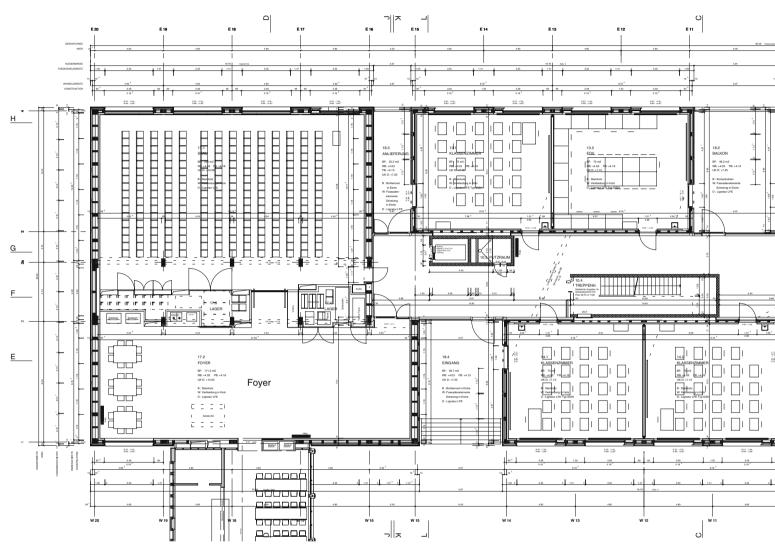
Plan of ground floor (reduced 1:50 working drawing)
